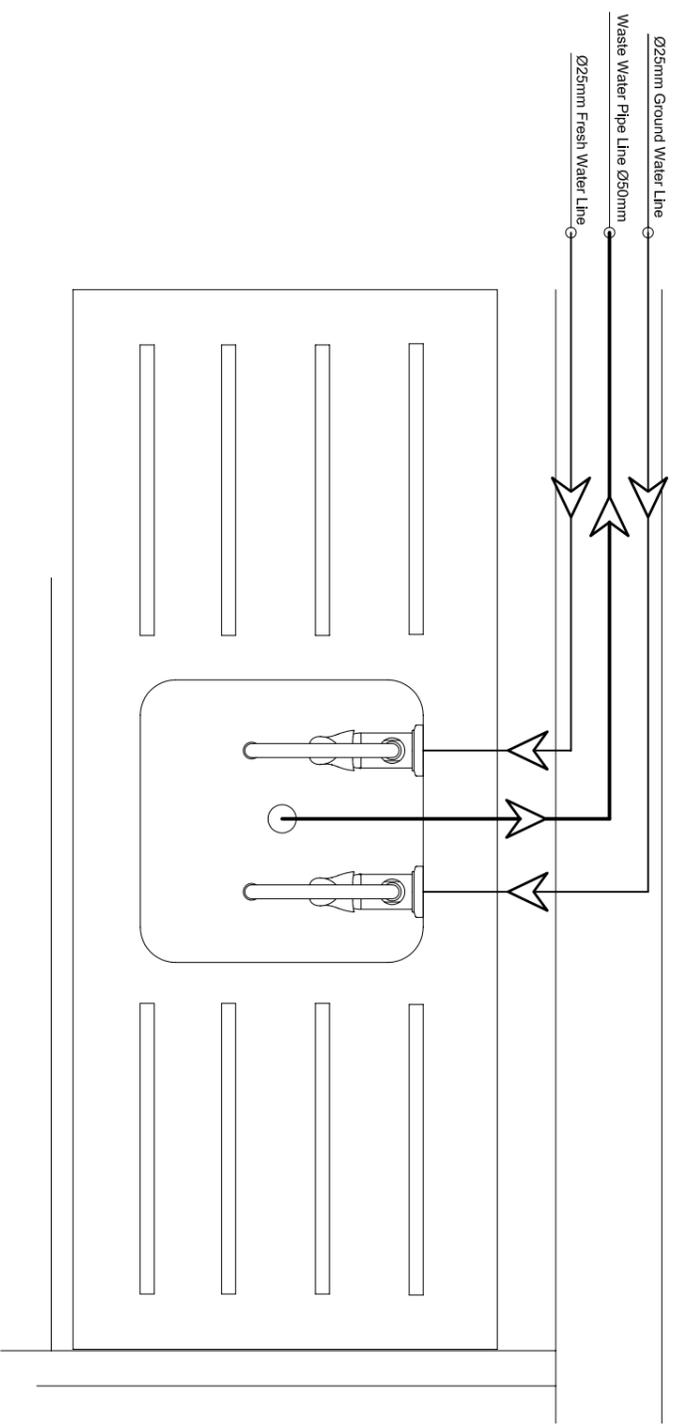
# DETAIL PLUMBING LAYOUT TOILET (FIRST FLOOR)
